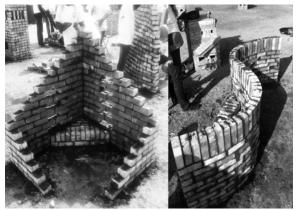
Examples of Folded and Curved Single Wythe Masonry Walls
